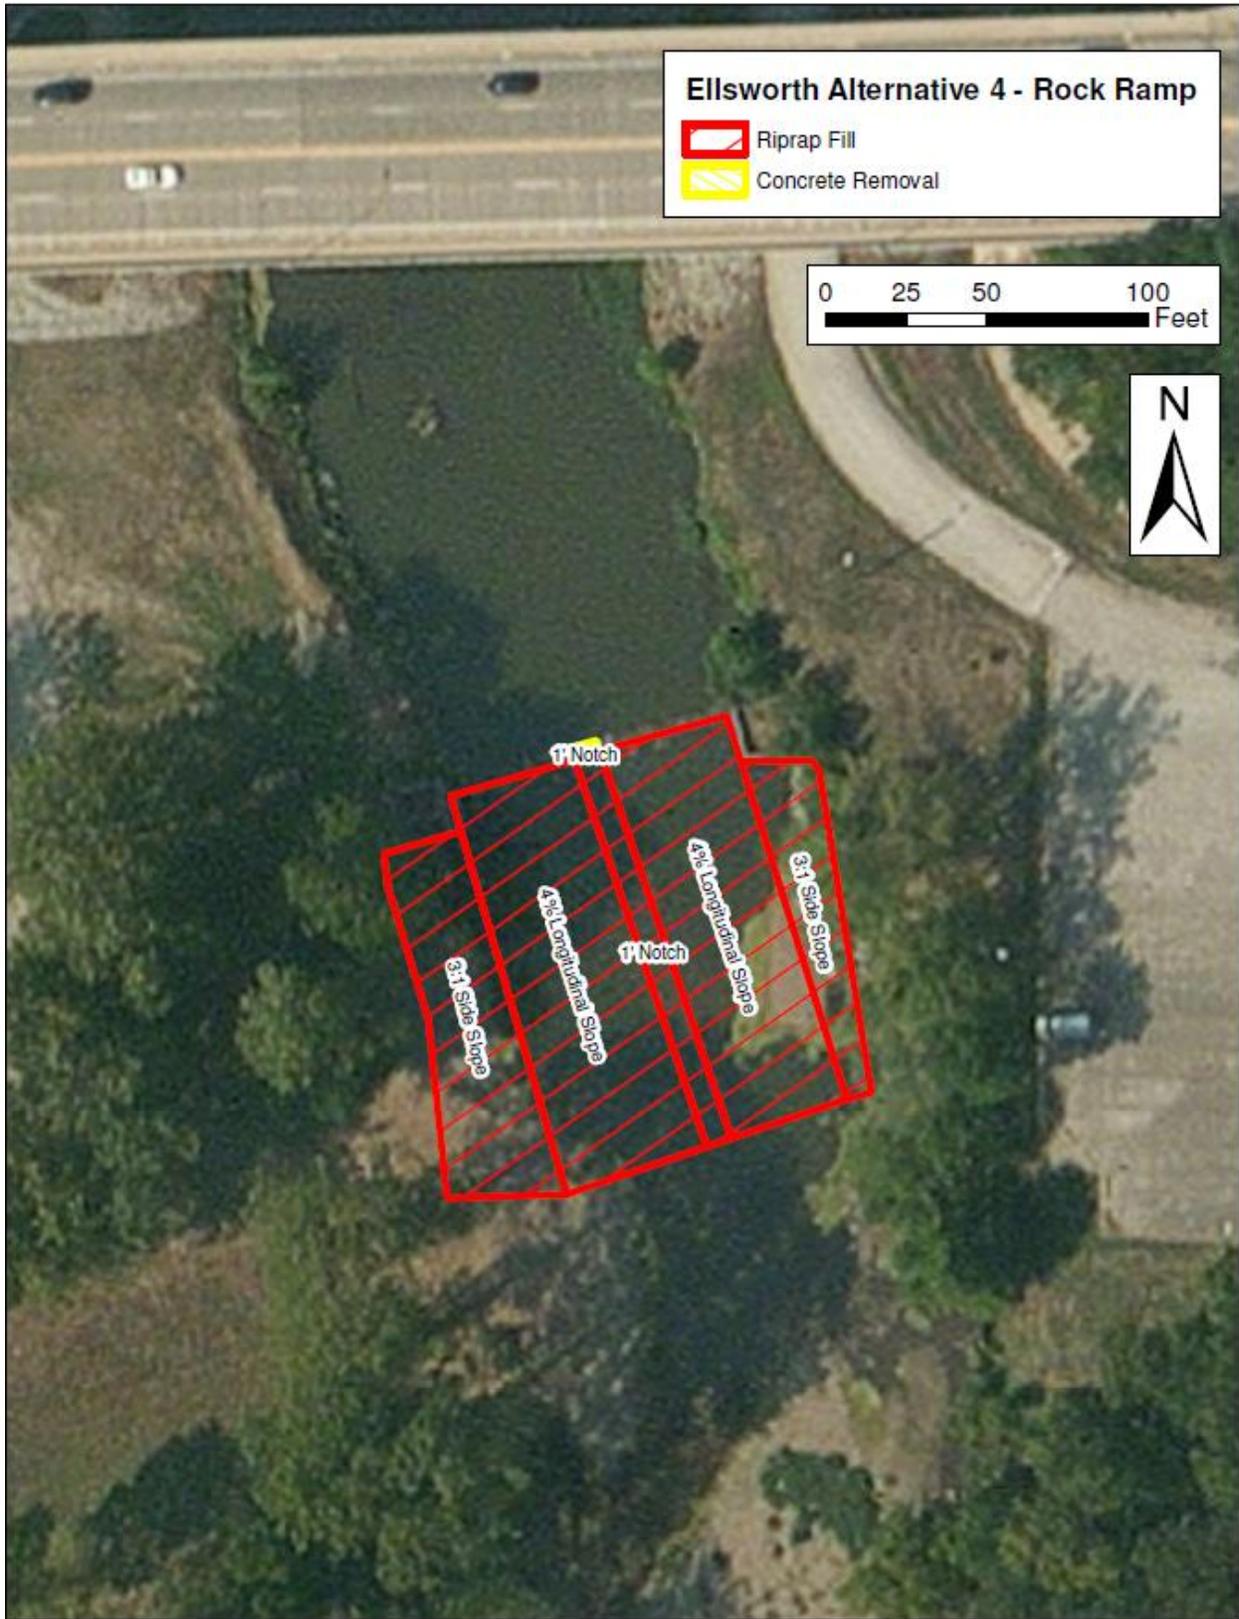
Ellsworth Park Dam Rock Ramp Overview
